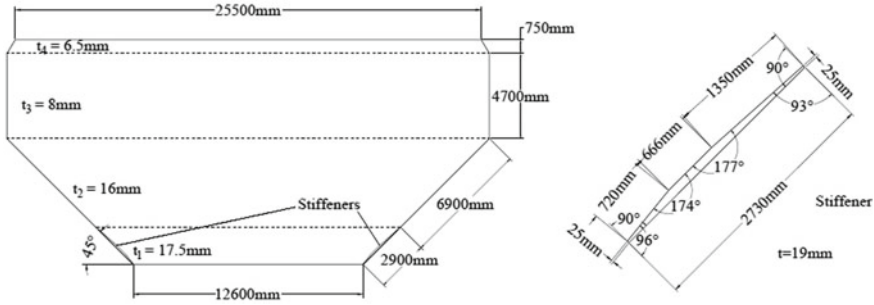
Geometry of the tank and stiffeners (elevation view)
